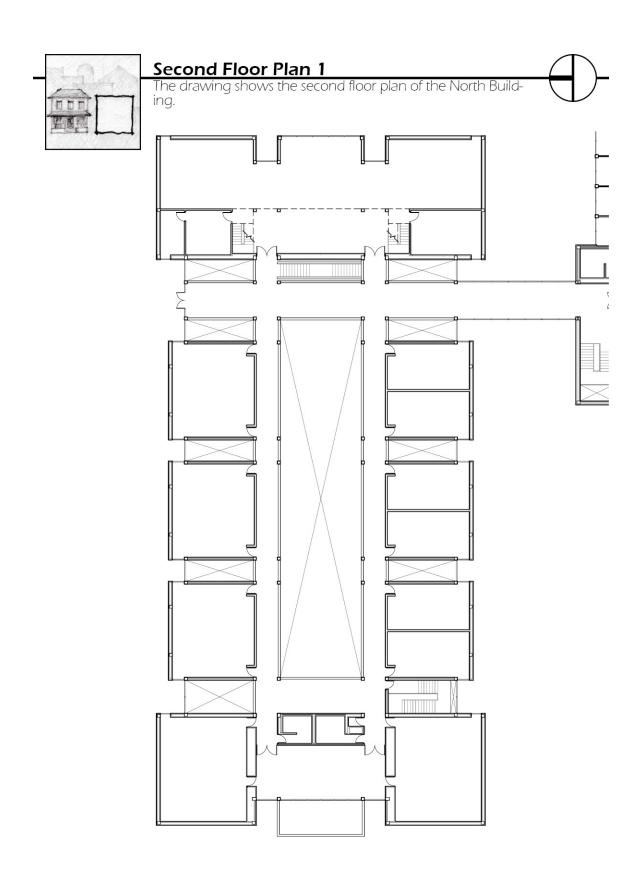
Antecedental Context - Second Floor Plan - Part 1
